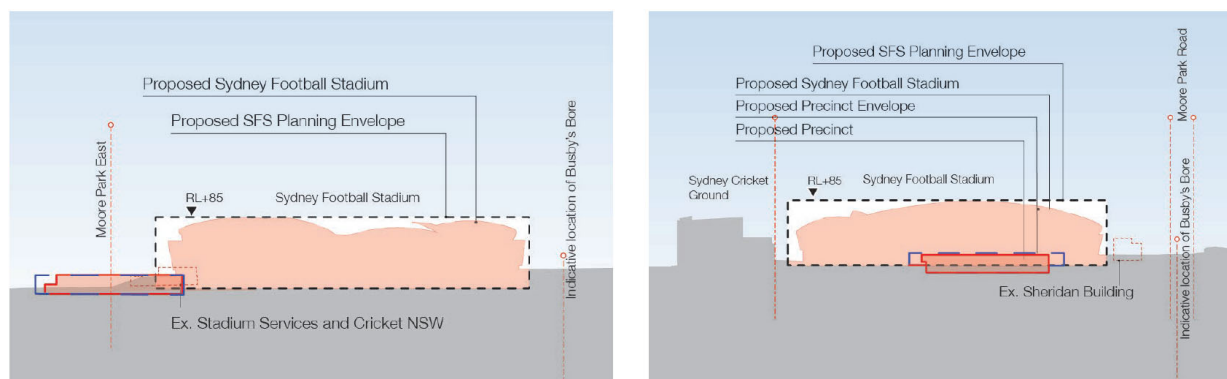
Precinct Village and Car Park building envelope in the context of the approved stadium envelope
